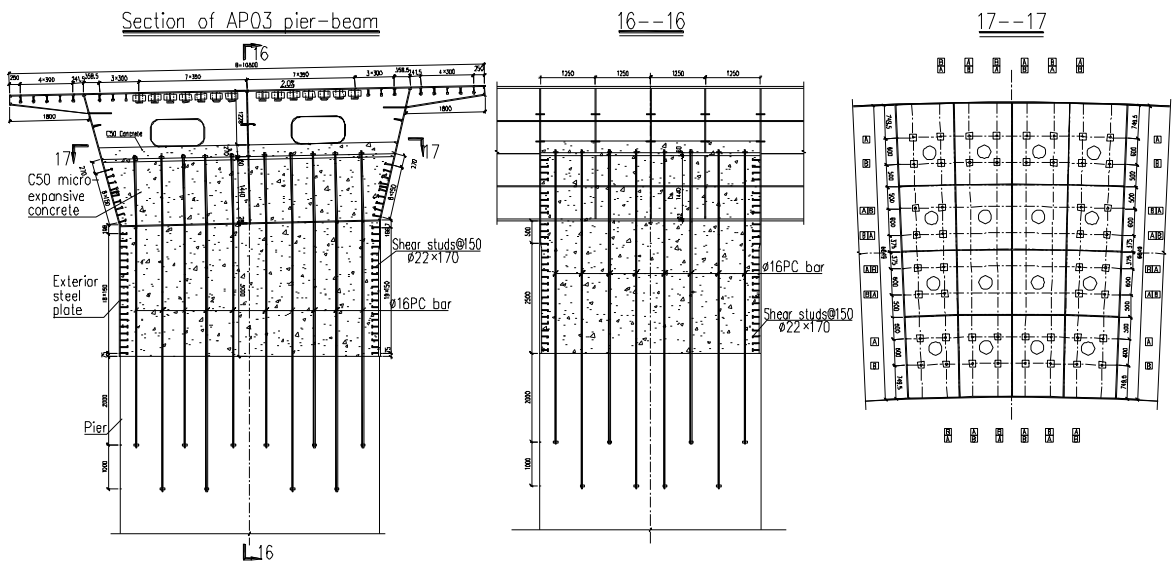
Prestressed anchor arrangement diagram of beam-pier consolidation (Unit: mm)
